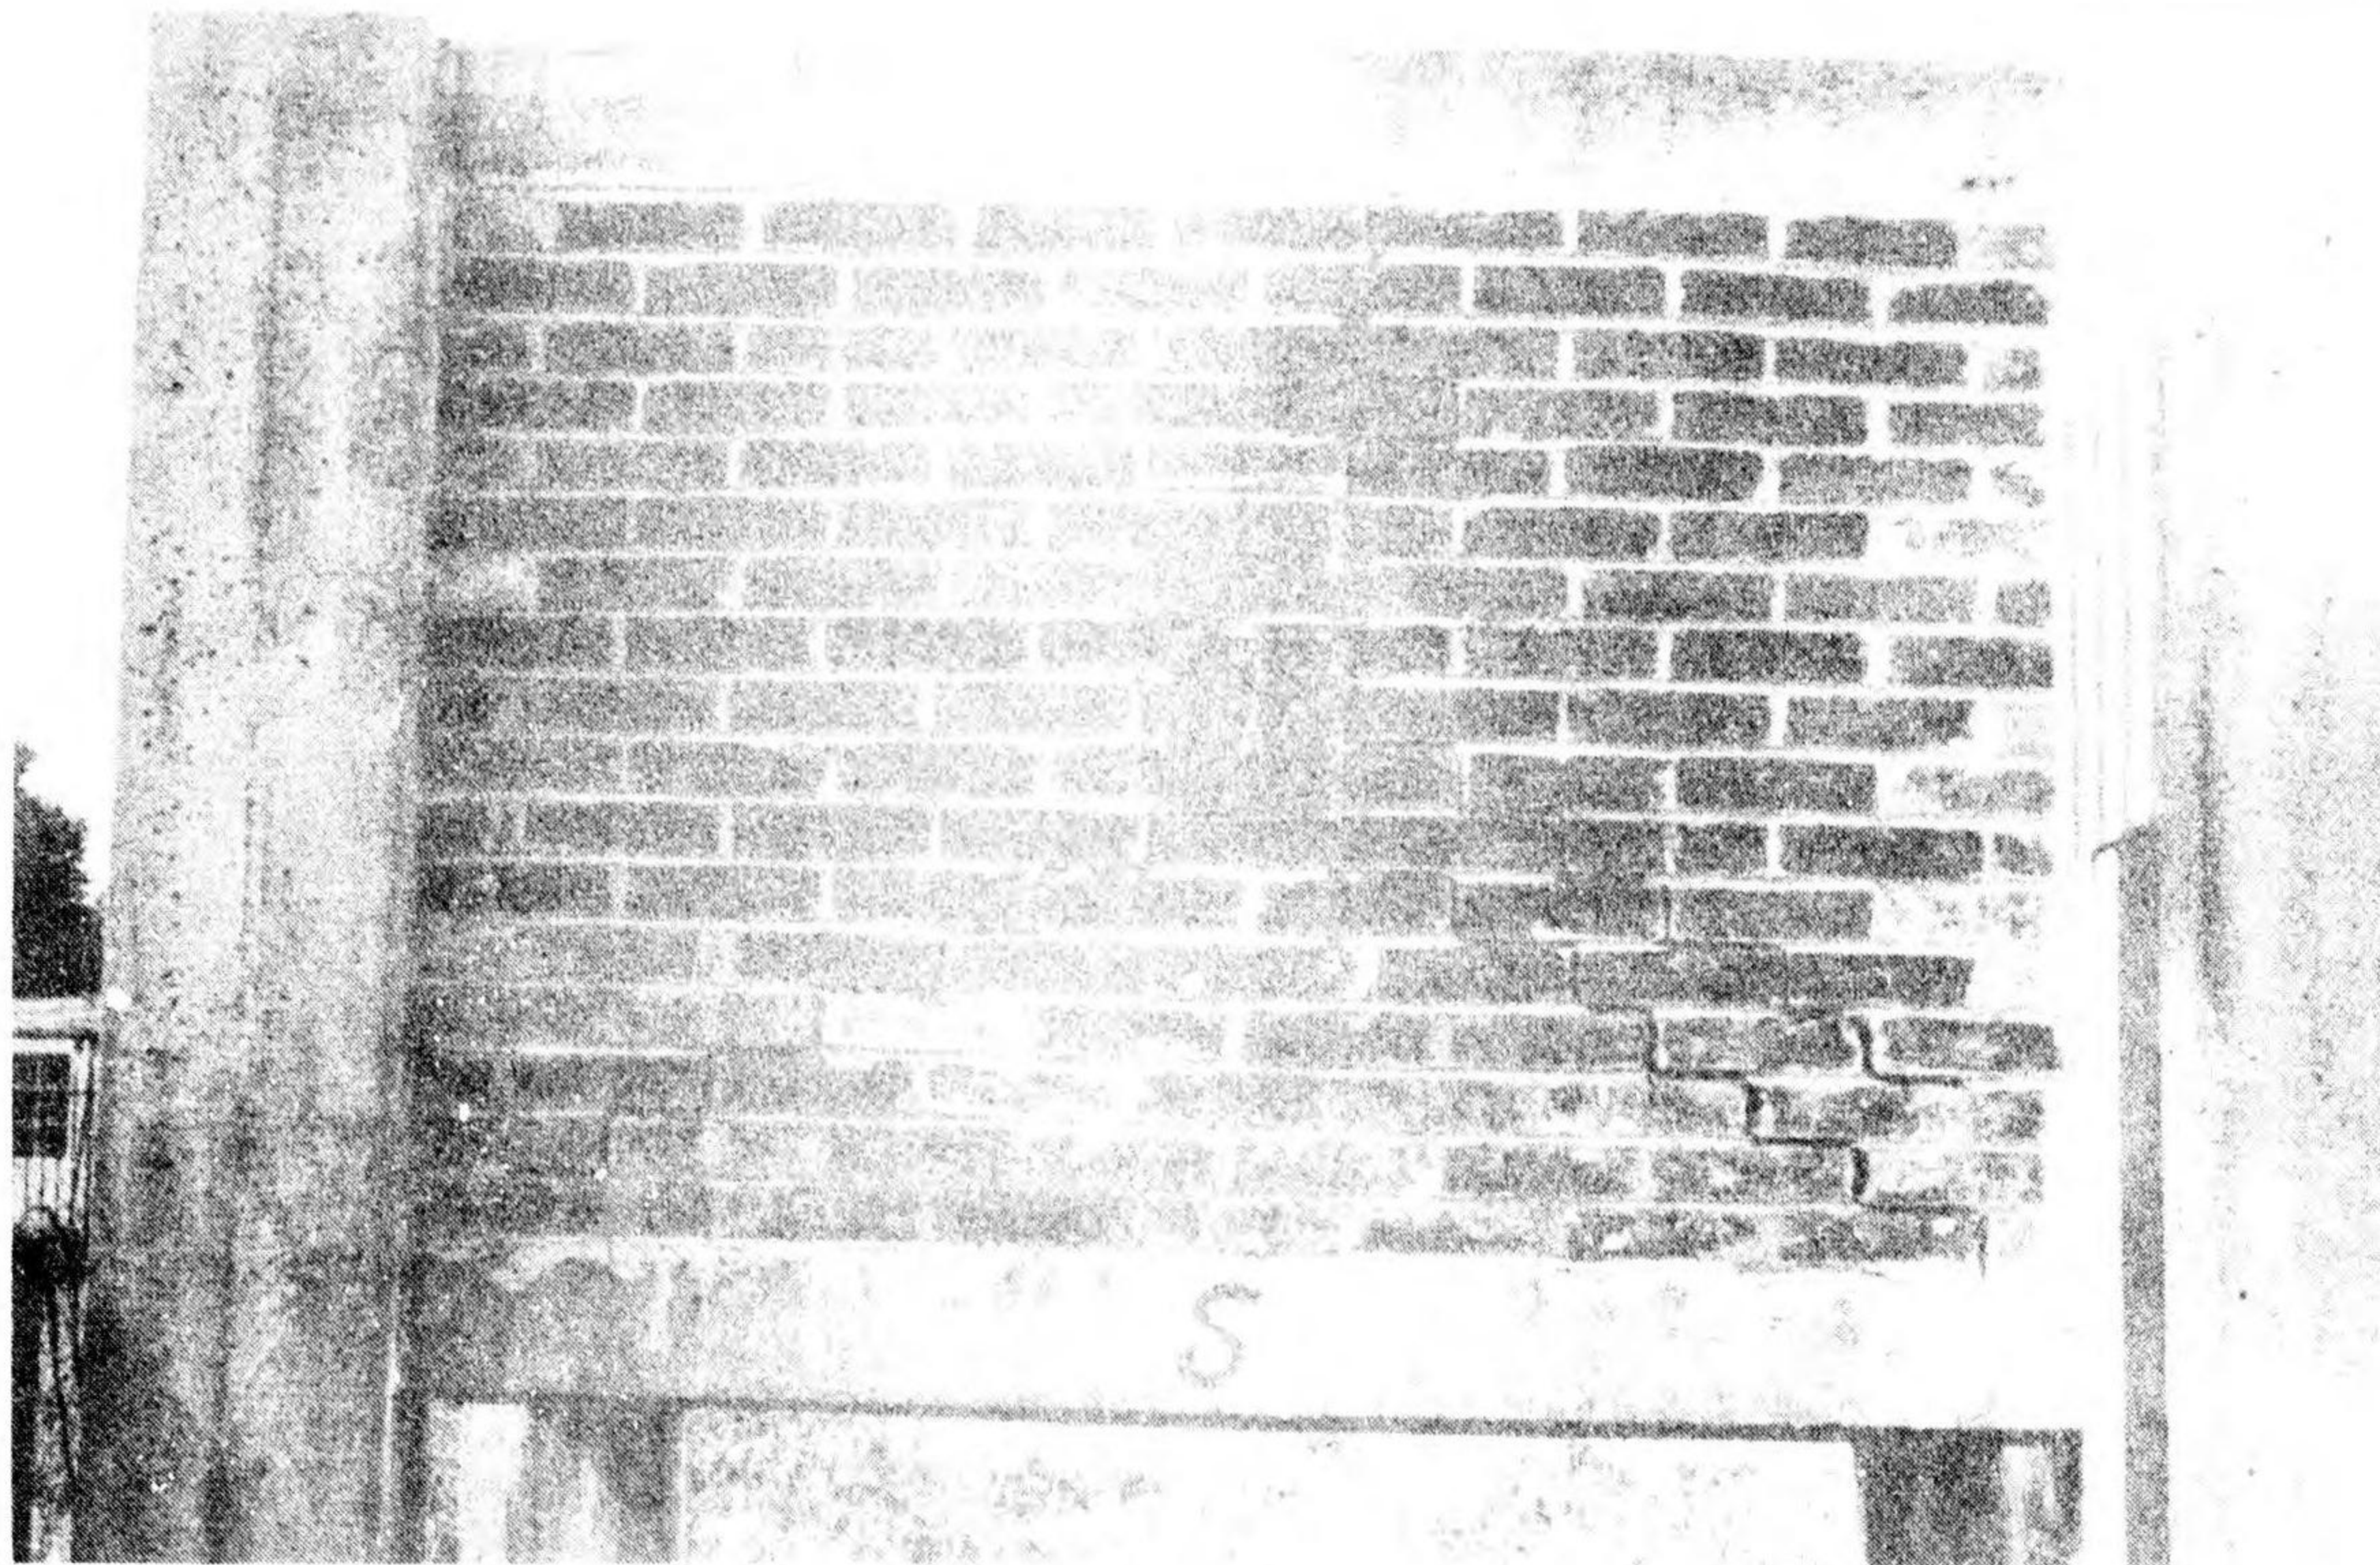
South wall of test structure after detonation of one 22-gm pellet of Teteryl.
